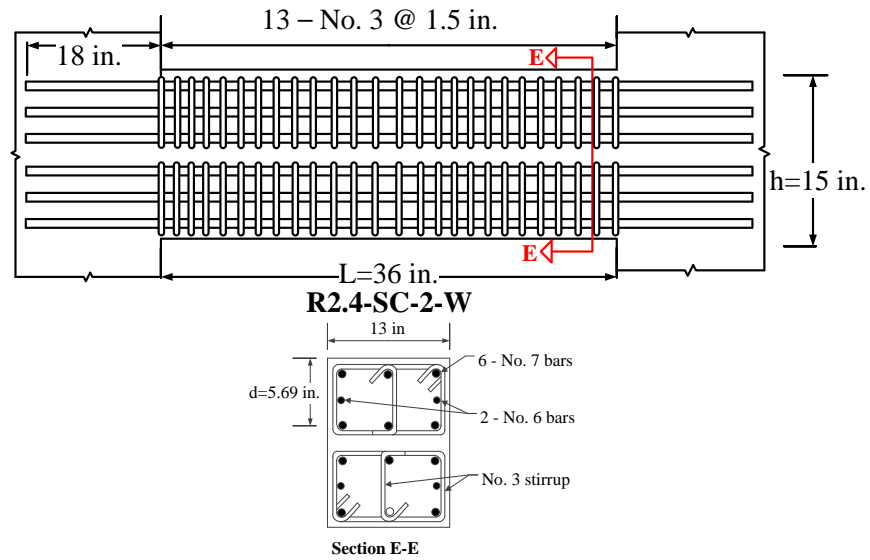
Reinforcement details of R2.4-SC-2-W
